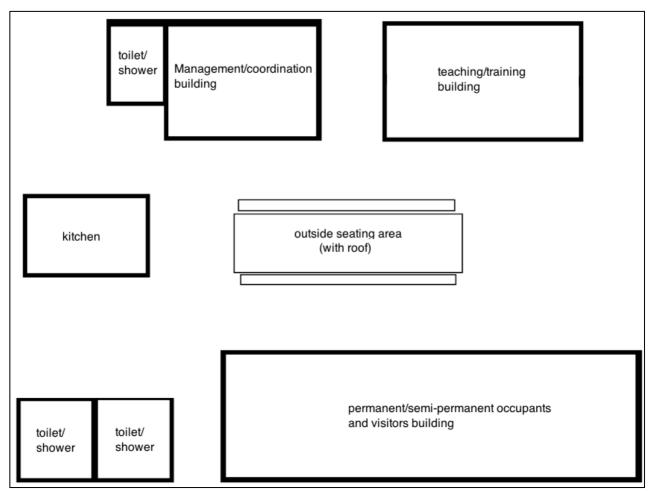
general proposed arrangement of the field station (note: not represented to exact proportions)
